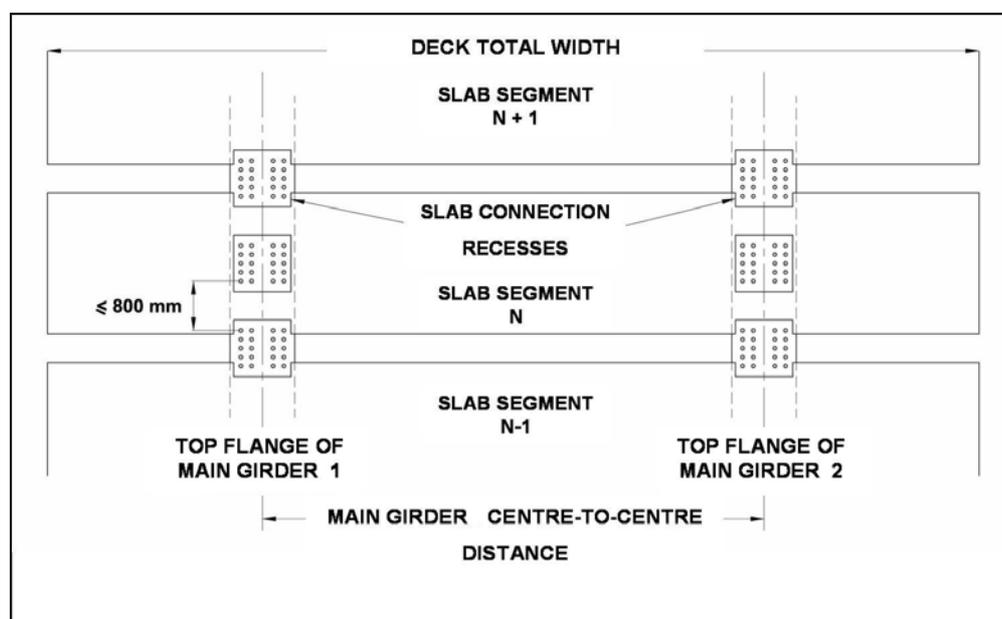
Grouped connector layout for a precast slab comprising full-width segments
